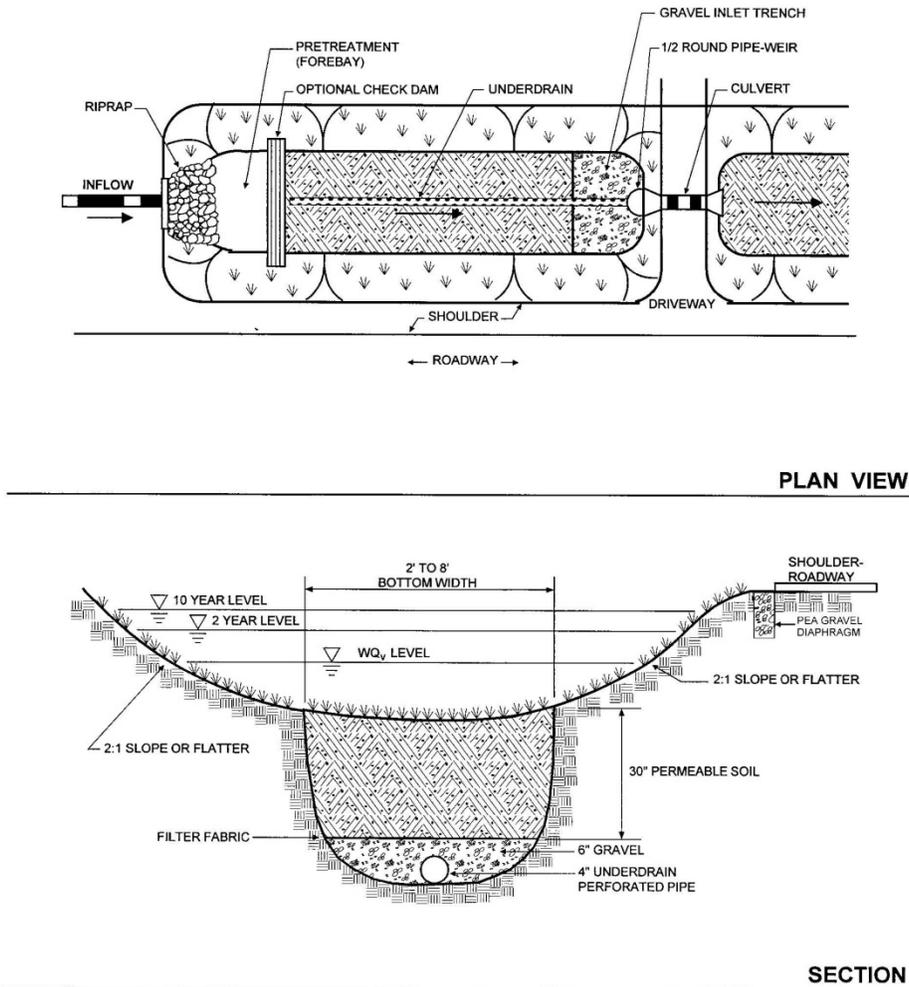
Bioswale typical plan and cross-section. Source: NYS Stormwater Manual
